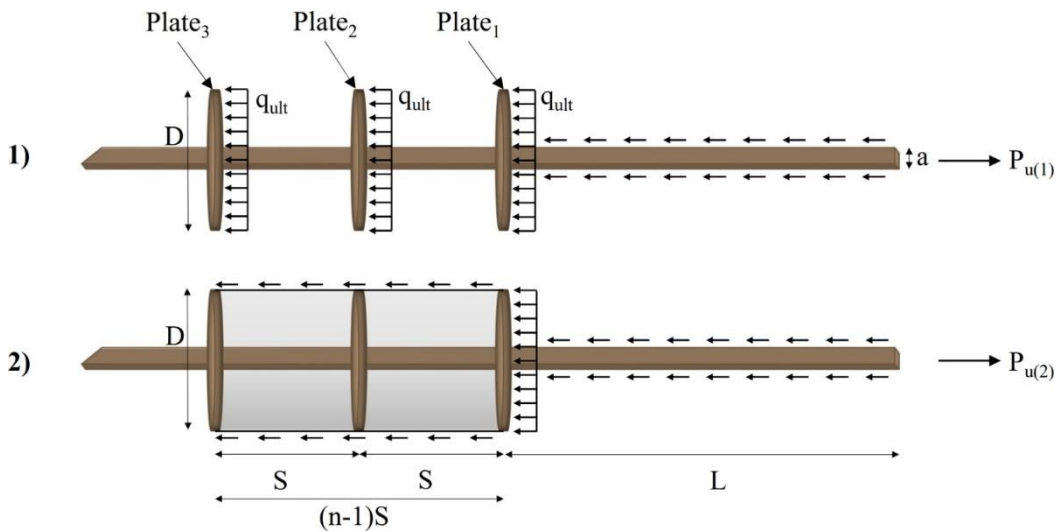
Types of failure mechanism for multi-plate anchors: (1) Individual plate failure, and (2) Cylindrical shear failure.
